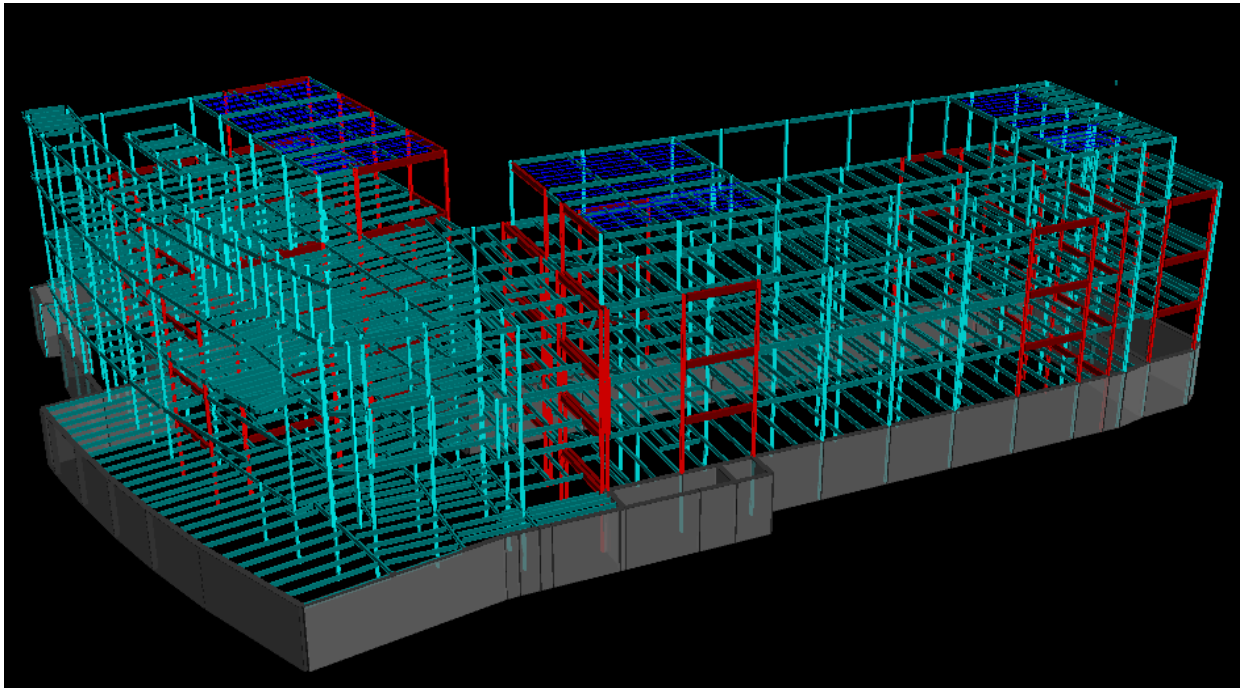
RAM 3-D View of Structural System with Lateral Bracing Highlighted (Northwest corner)
